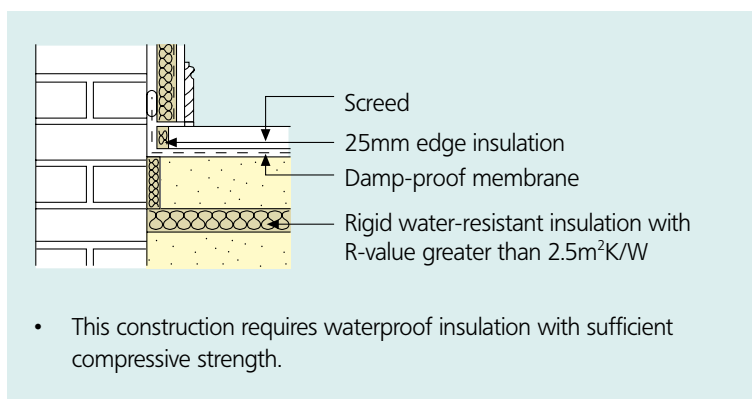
Concrete ground-bearing slab with Insulation below slab
